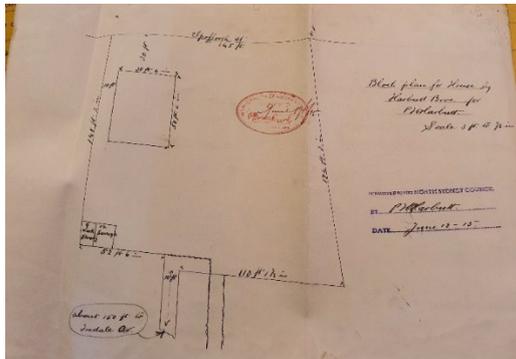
87: Block plan for BA 15/2936 for No. 6 Lower Spofforth Street (Walk) submitted by Percy Harbutt.
